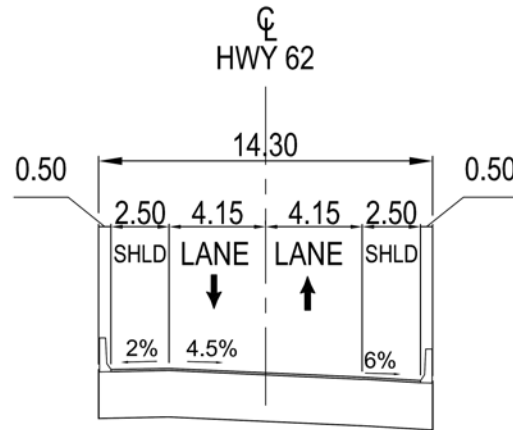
Proposed Two-lane Rural Cross-section for Highway 62 (Interim)
